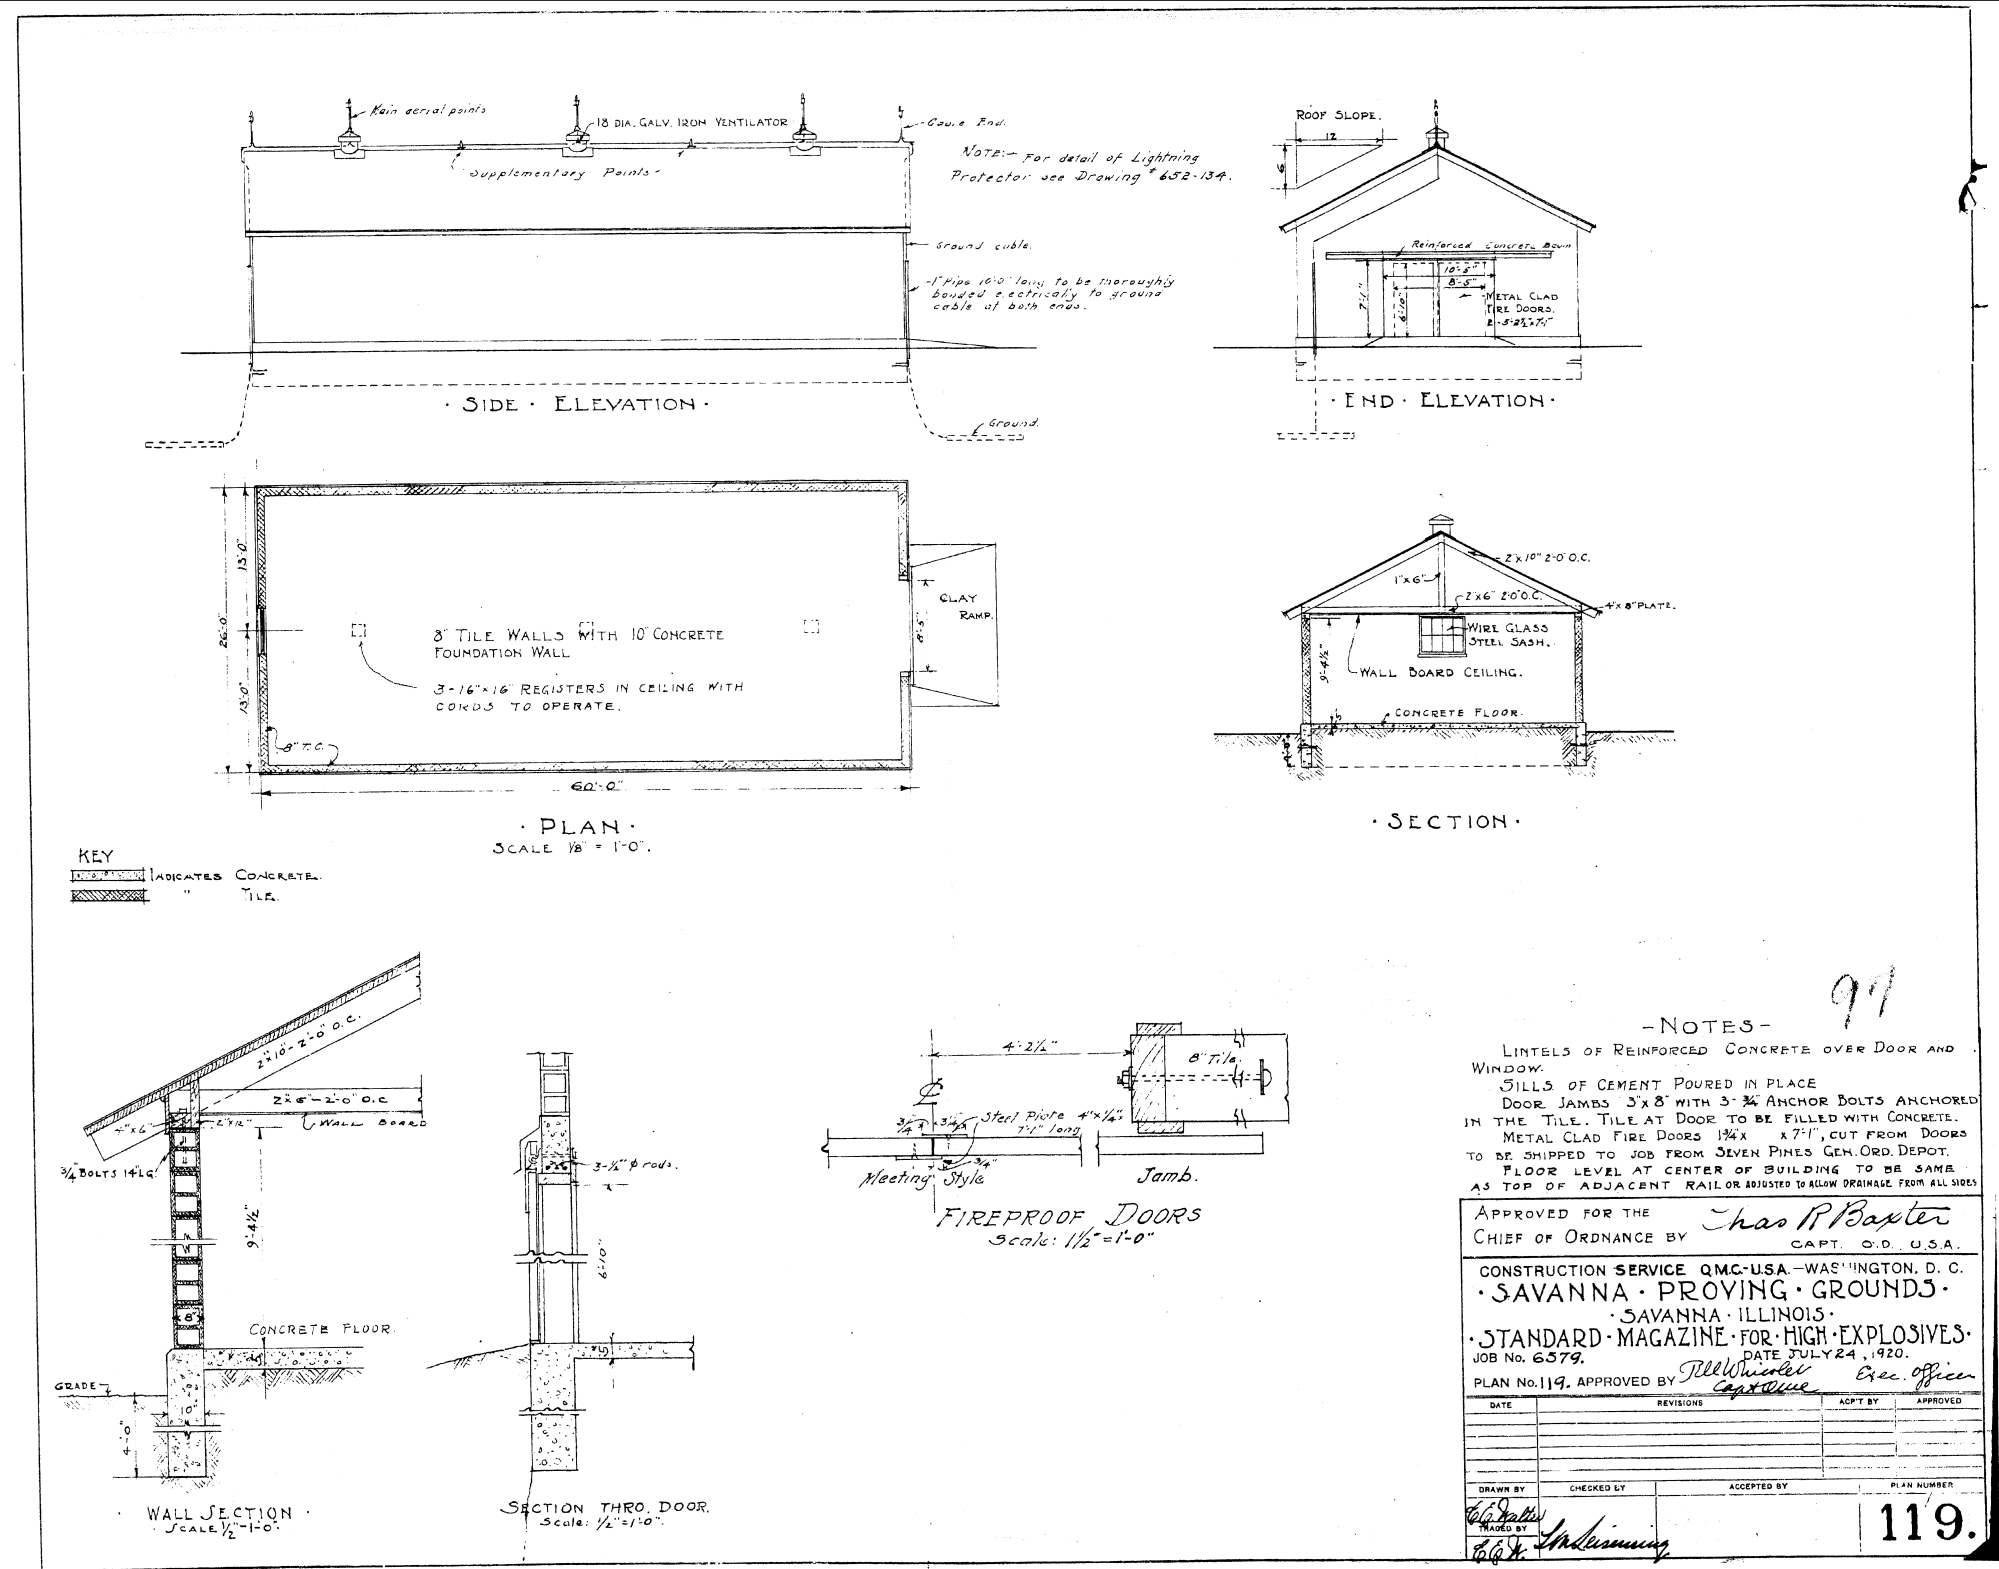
Plans and elevations for standardized aboveground magazine for high explosives.
